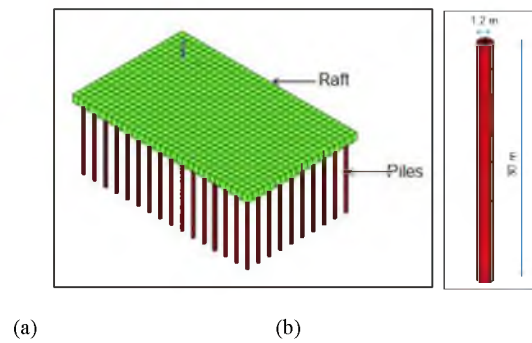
Isometric view of foundation (a) Piled raft, (b) Enlarged view of one pile
